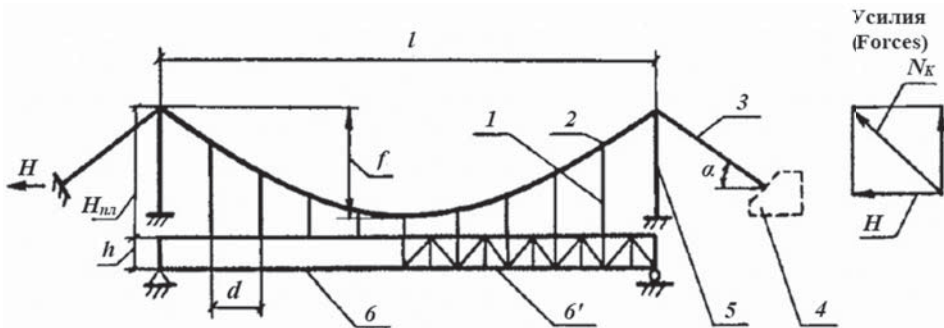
Suspension bridge: 1 – vertical suspender; 2 – main suspension cable; 3 – anchor cable; 4 – anchorage; 5 – pylon; 6(6') – stiffening girder (truss); l – span of the bridge; N_k is the force in the anchor cable; H – thrust
